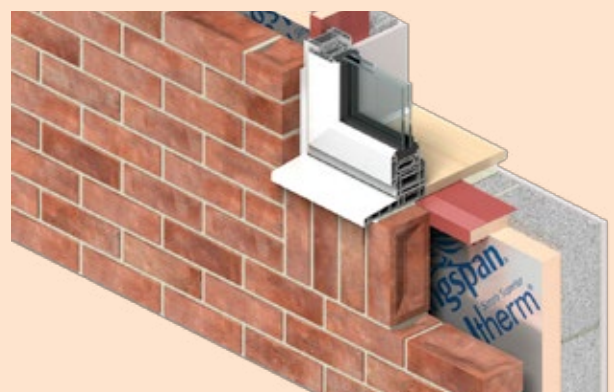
Kingspan Kooltherm®K5 External Wall Board
